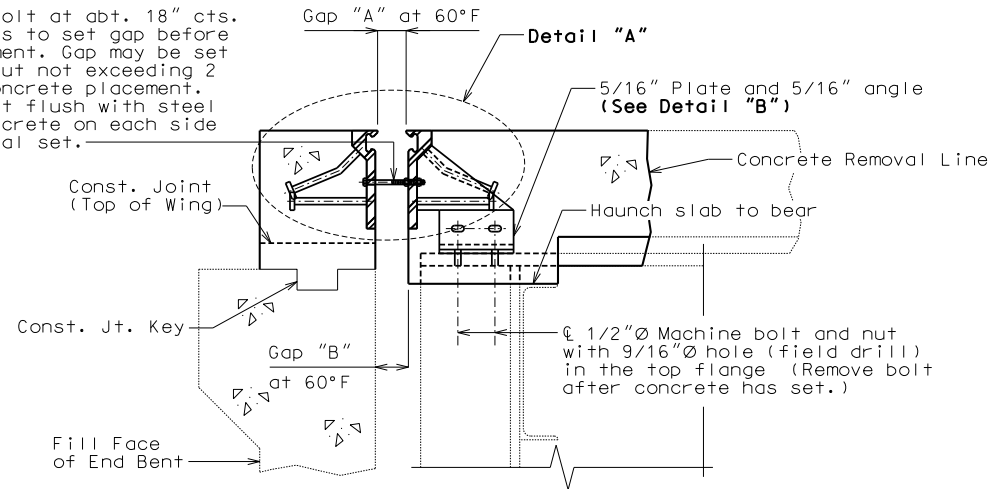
DETAILS OF SLAB BARRIER CURB AT JOINT 2 NEAR END BENT 6
